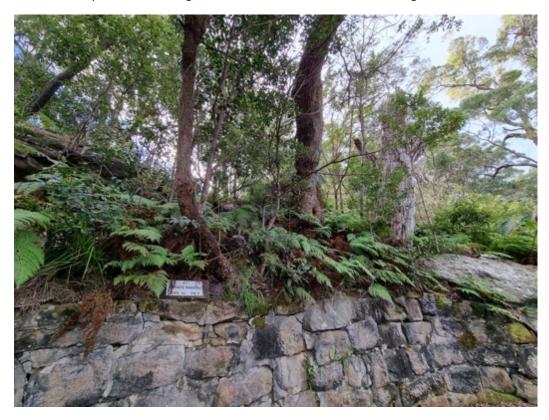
Location of the proposed driveway access point and vegetation zone one.
